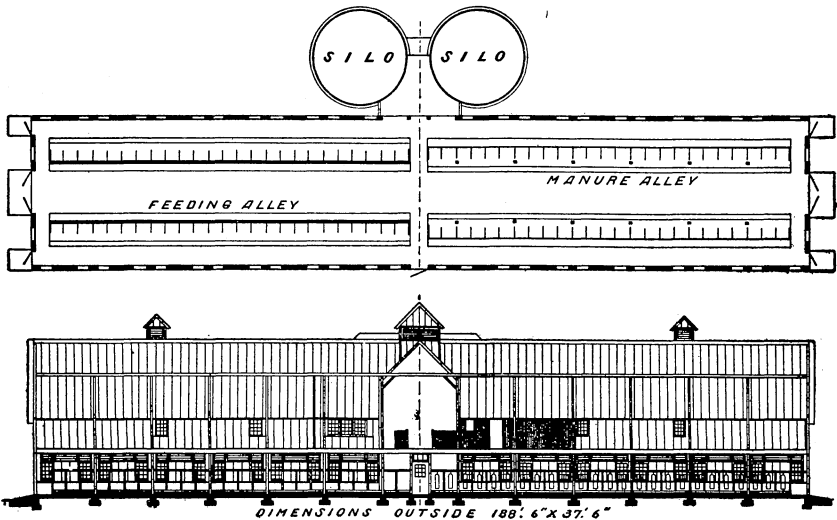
Floor plan and longitudinal section of two-story stable for 100 cows.
